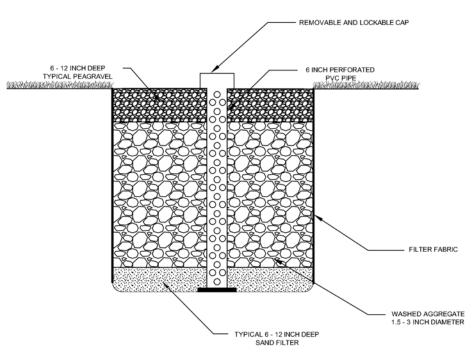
A. Typical cross-section of an infiltration trench
